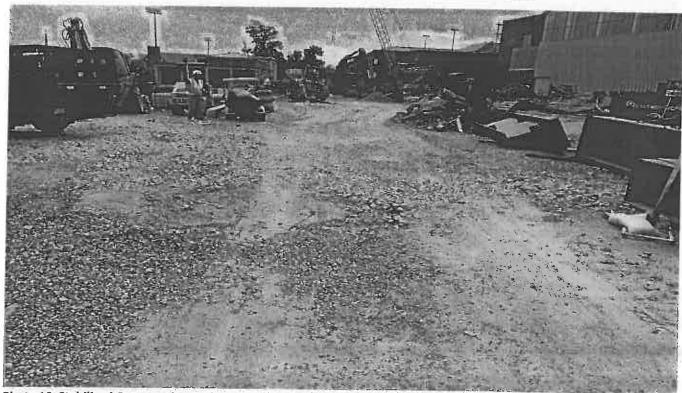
Stabilized Construction Entrance on Cole Fieldhouse Drive NW of the site
